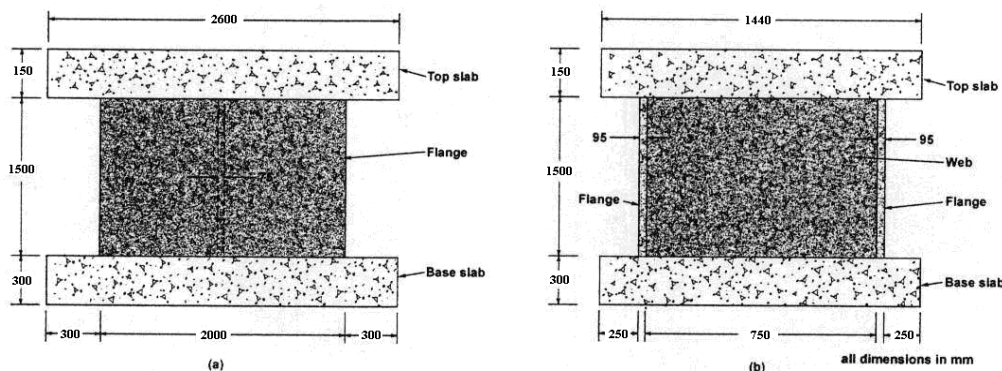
Test specimen details: (a) end view; (b) side view. [11]
